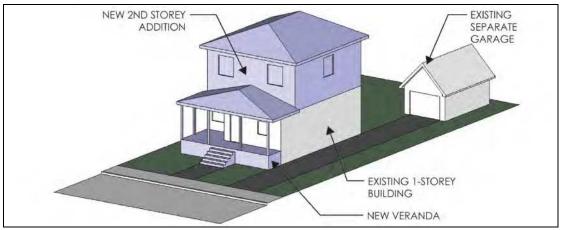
Example of new 2nd-storey addition with veranda on a 1-storey building on a contributing property
